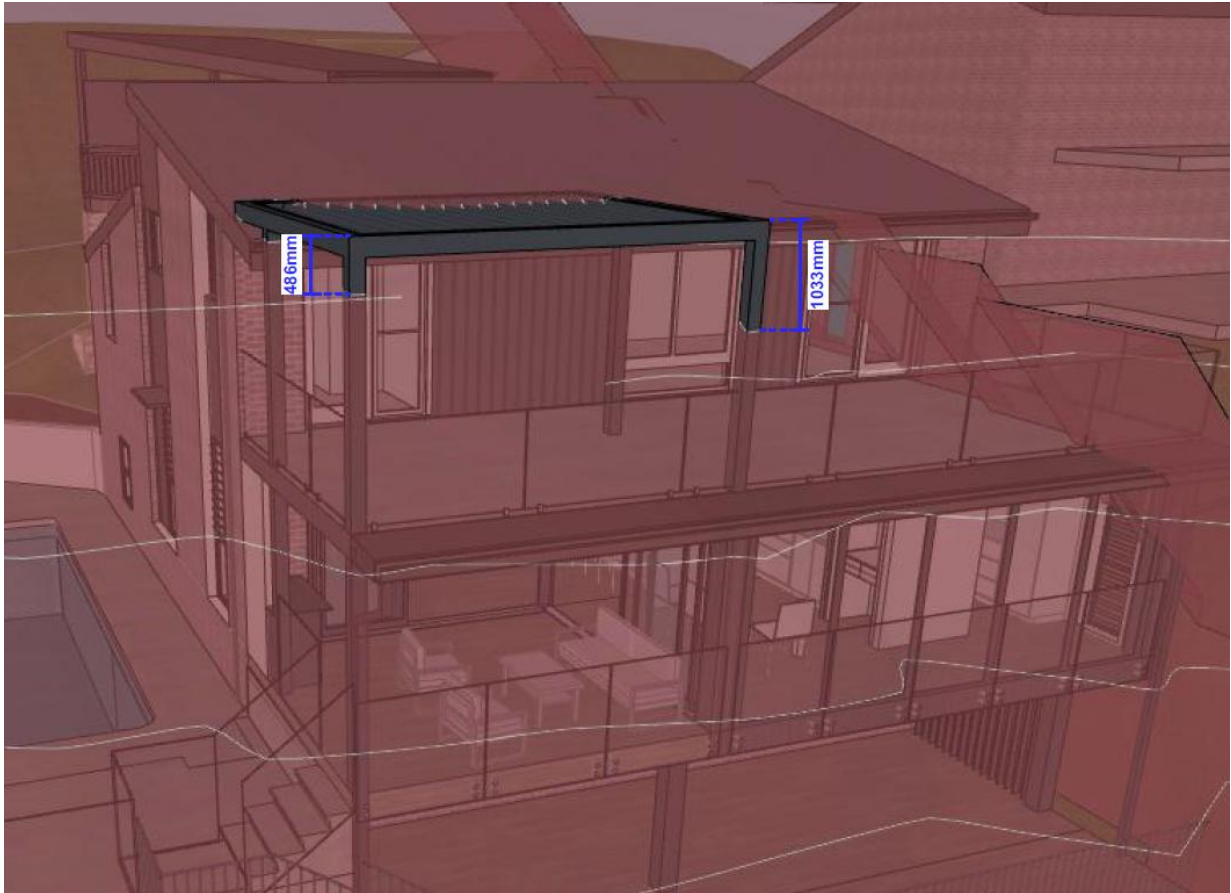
Relationship of first floor pergola to the 8.5 metre building height plane
